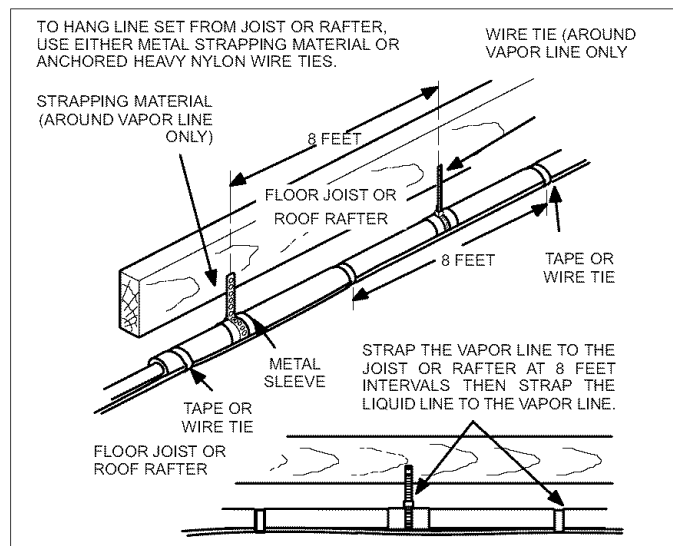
Refrigerant Line Sets: Installing Horizontal Runs
